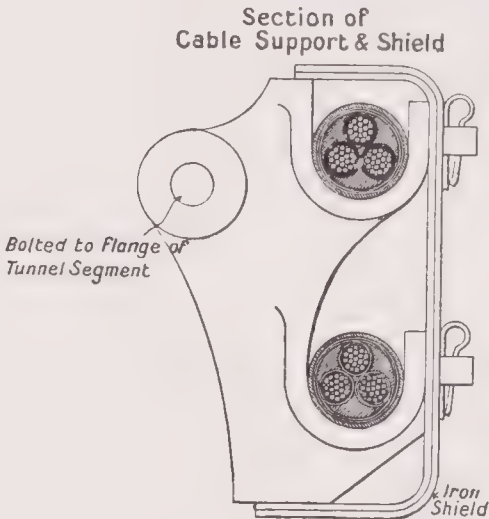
ARRANGEMENT OF CENTRAL LONDON RAILWAY CABLES.
